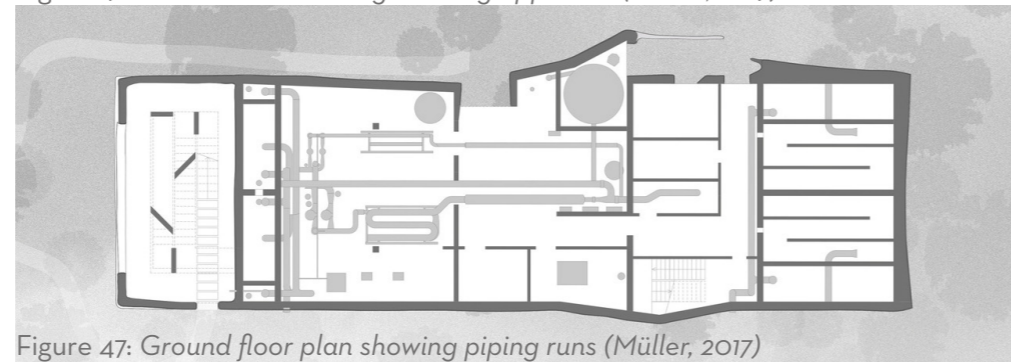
Ground floor plan showing piping runs (Müller, 2017)
